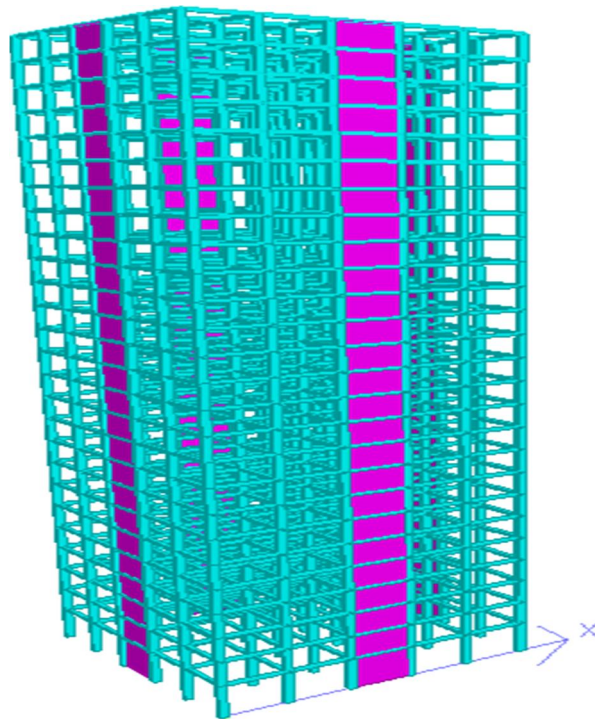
Figure D Elevation view of Model with soft Storey at 13th & 25th floor provided with shear wall.
